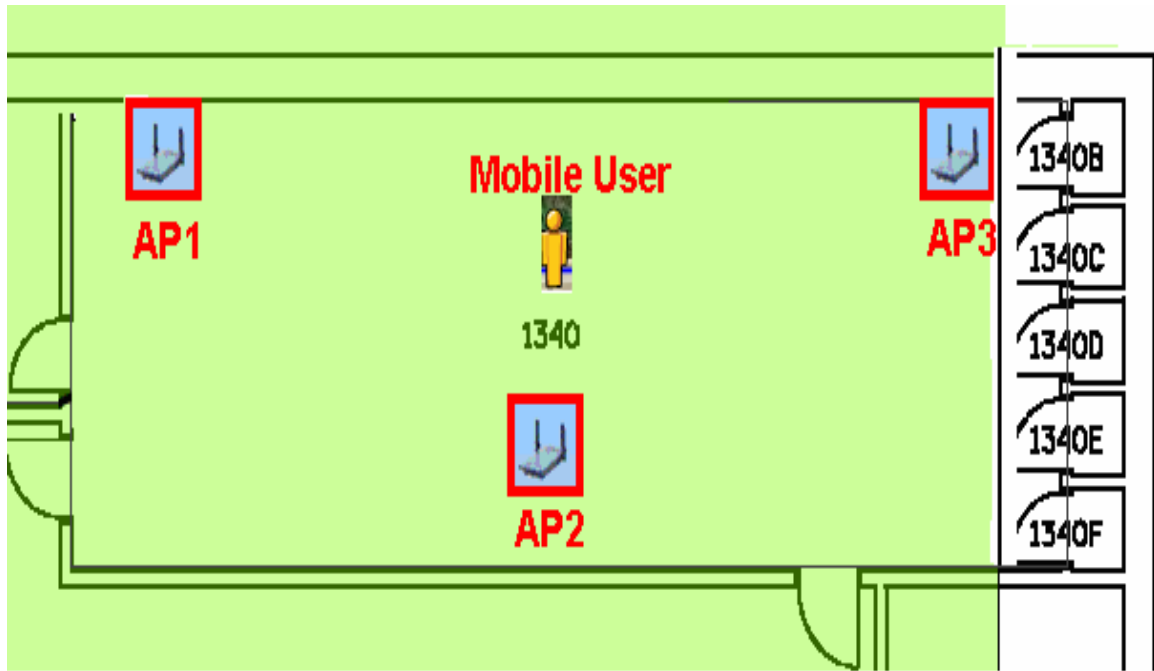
Plan View of the Testing inside the Construction Engineering Laboratory (Room 1340 GGB Building)
